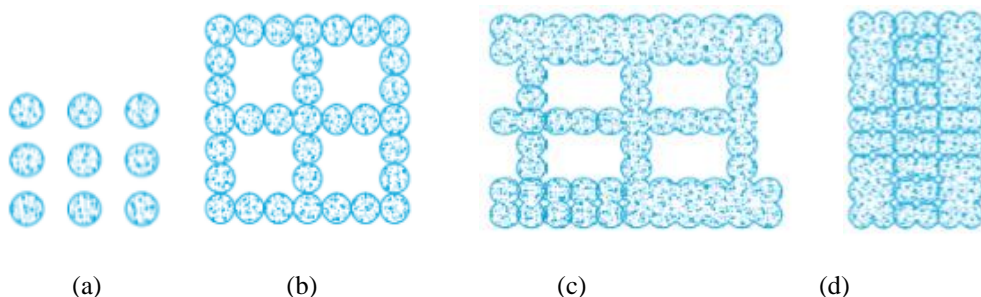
Different types of columnar structure constructed with DSM (a) isolated columns, (b) grid, (c) grid with overlapping columns, and (d) block with overlapping columns (modified after Topolnicki, 2004)
